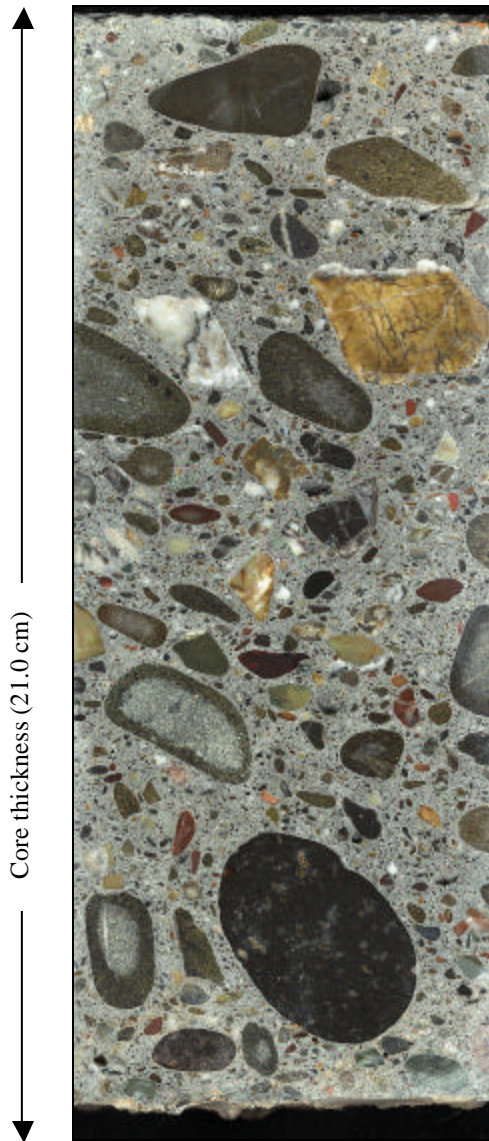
Polished cross-section of pavement section 06-CS3.
